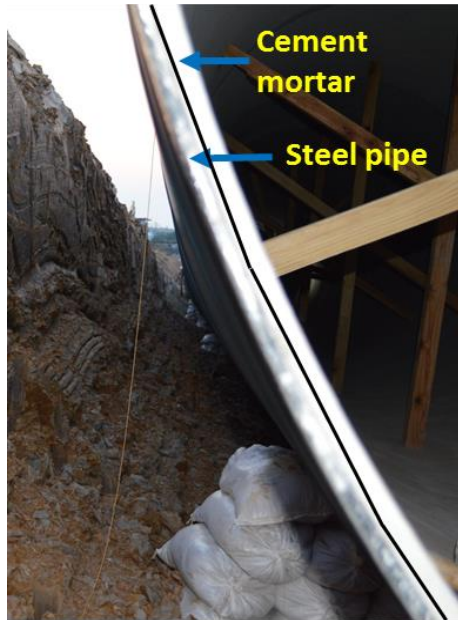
Cross section view of bond between steel pipes and cement mortar
